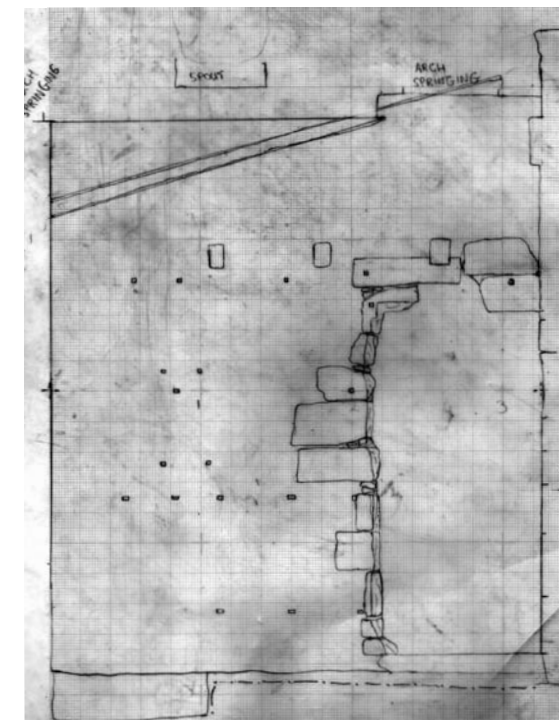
NW facing internal elevation of Western Chamber - Drawing No.012
